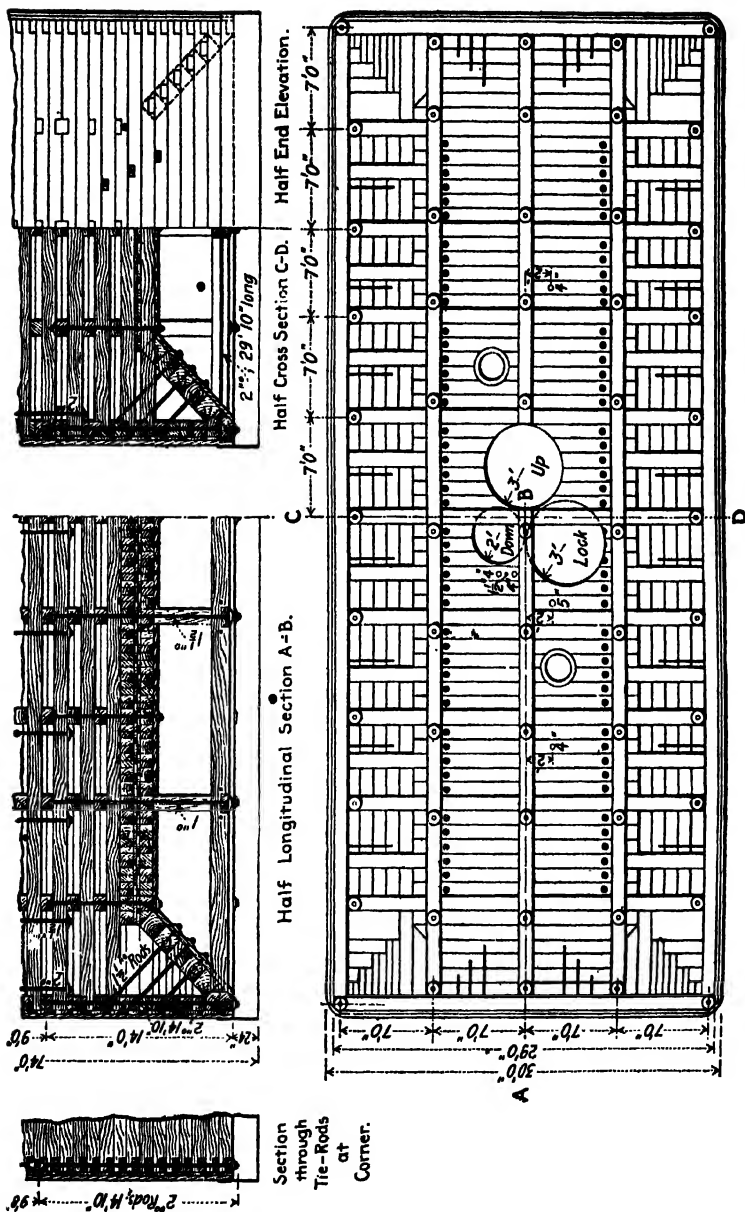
Pneumatic Caisson for Pier IV of Bellefontaine Bridge. Designed in 1892.
